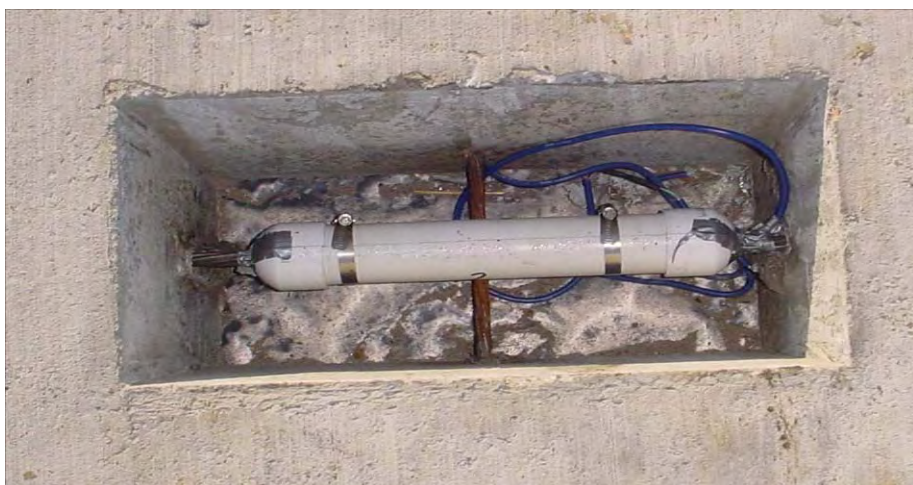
Instrumented rebar installed longitudinal and transverse to the direction of traffic
